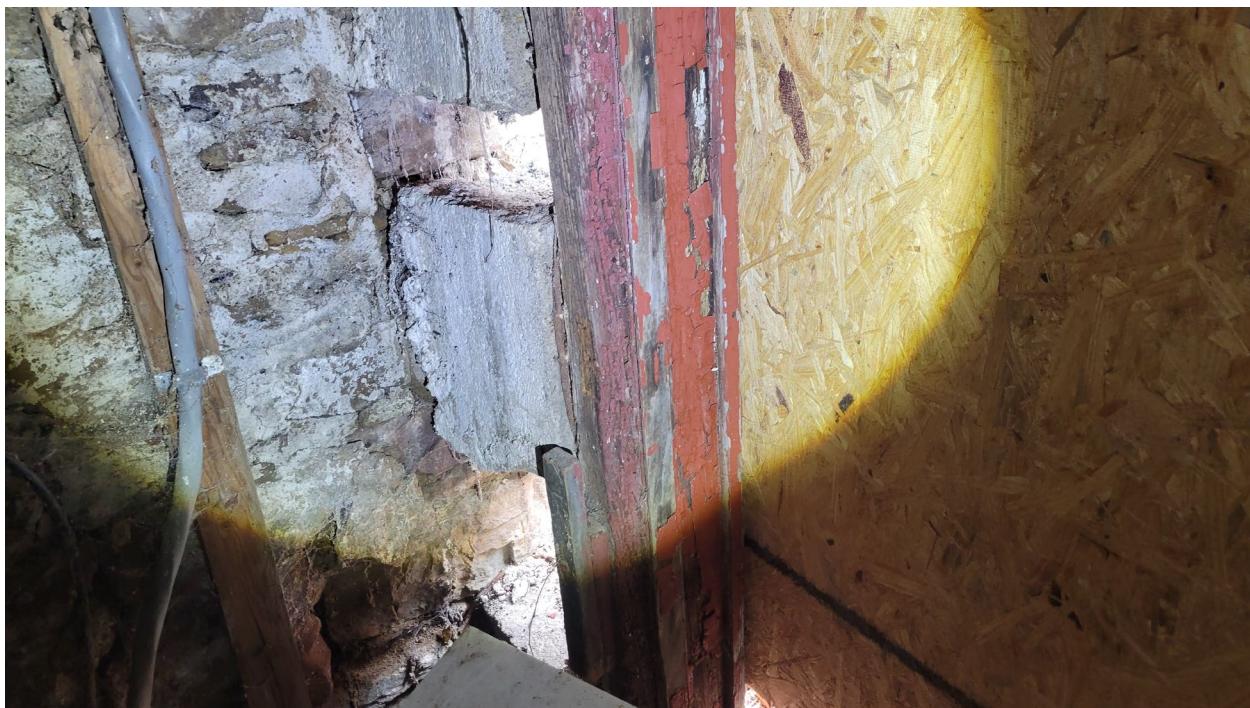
Area 5, needs extensive repair work done to foundation. See Note 7
